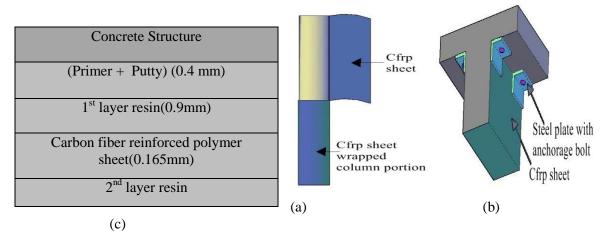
(a)Thickness of material layers of cfrp sheet application on concrete structure by Scanning Electron Microscope (SEM) (Tumilian,1998), (b) Cfrp sheet application on column, (c) Cfrp sheet application on beam (Kanakubo et al., 2000).
